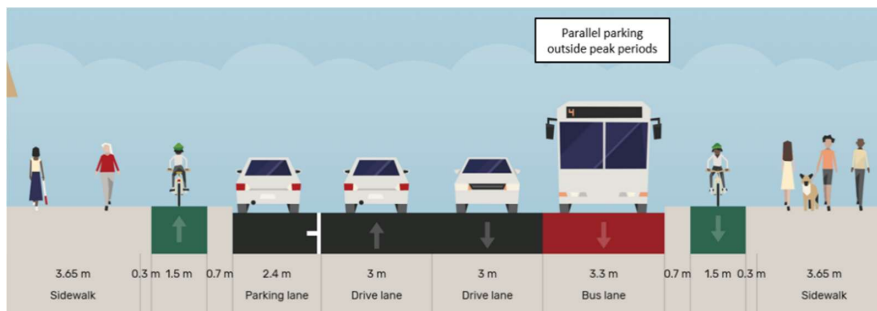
Option 3 – Hutt Road Indicative Plan and Cross Section
